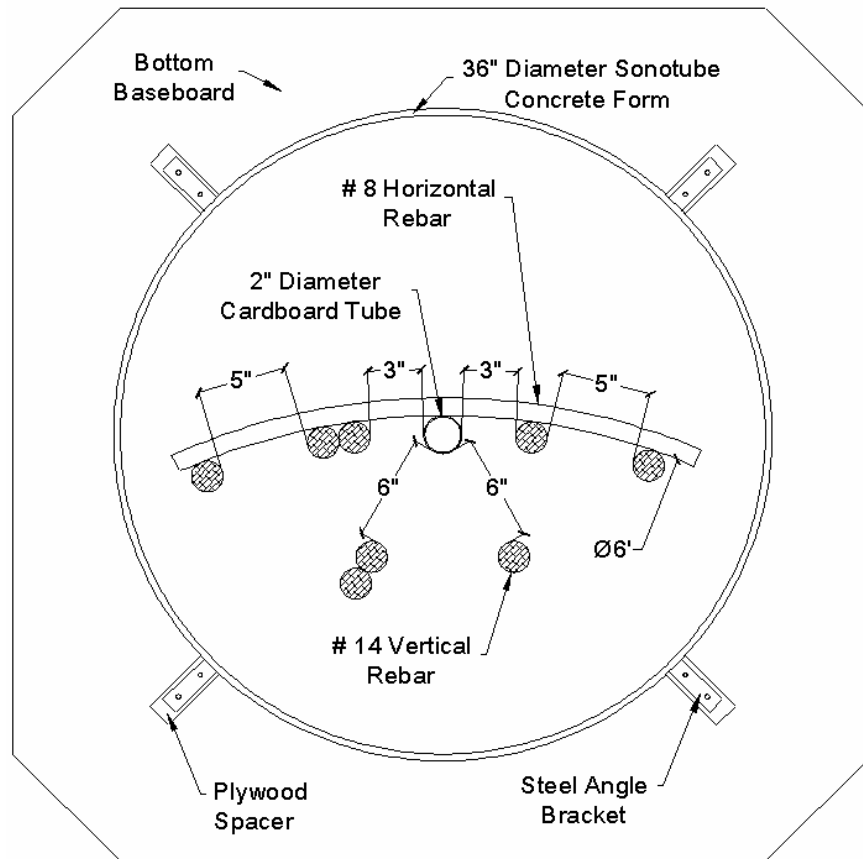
Plan View of a 2-inch Inner Diameter Ring Sample Designed to Simulate a Section of a 6-foot Diameter Drilled Shaft (including #14 Longitudinal Reinforcement and #8 Transverse Reinforcement)
